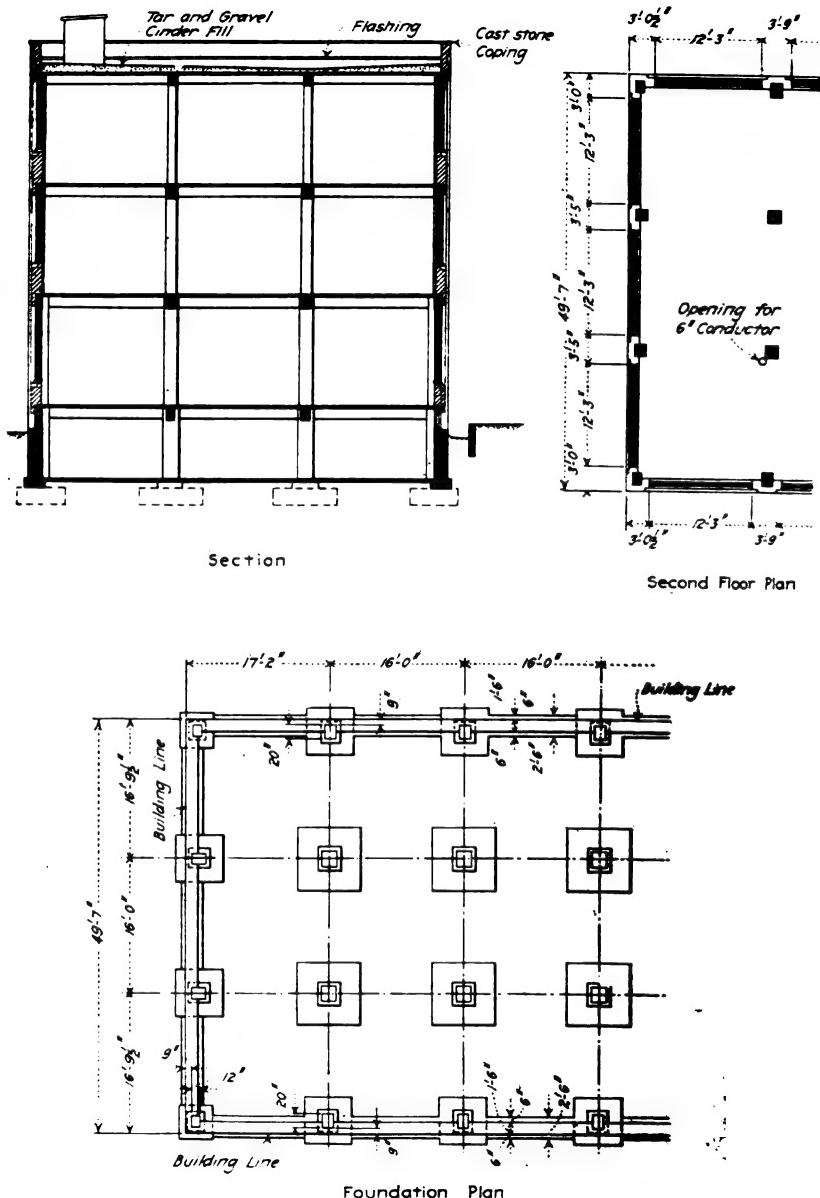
A.—Factory addition, Bradley Knitting Works, Delevan, Wis.
